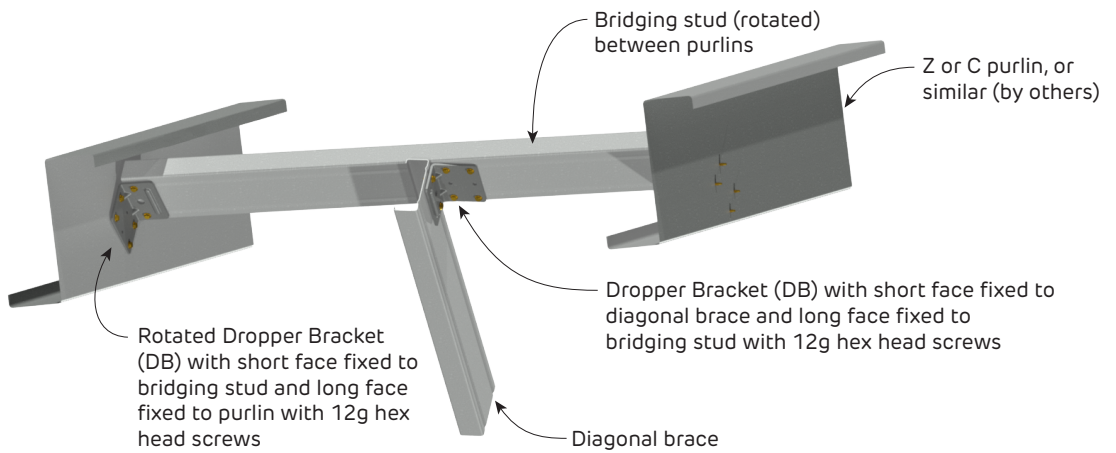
Alternative Diagonal Brace to Bridging between Purlins
